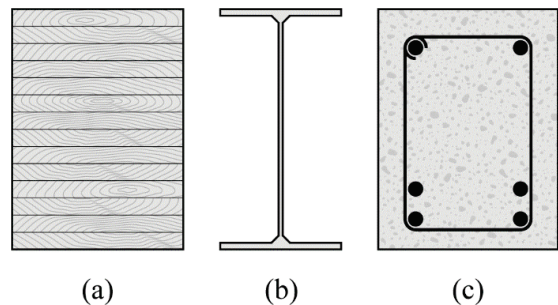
Cross-sectional schematic diagram of beams designed for (a)GLT, (b)Steel, and (c)RC.
